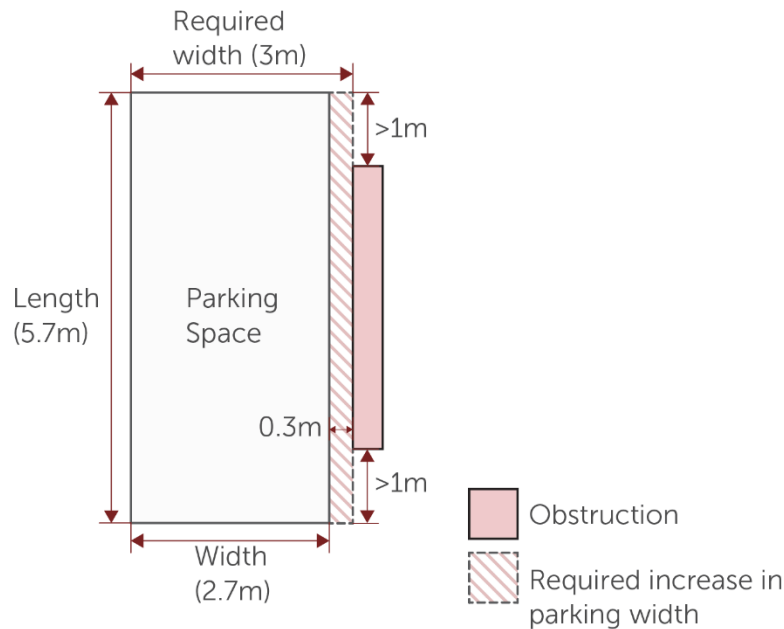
Section 10.6.2 – Obstruction of a Parking Space
